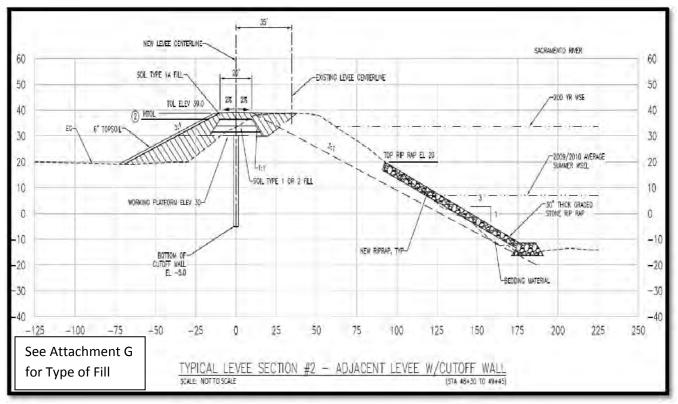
Typical Cross Section – Adjacent Levee with Cutoff Wall
